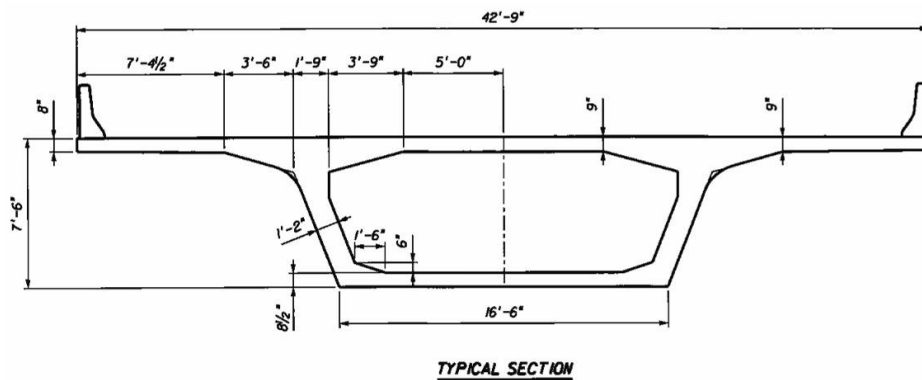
Dimensional drawing of typical box girder cross-section.
